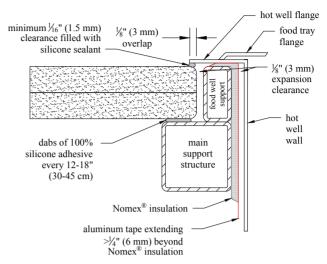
Cutout Cross-Section View with Tube Steel Support at the Underlayment
